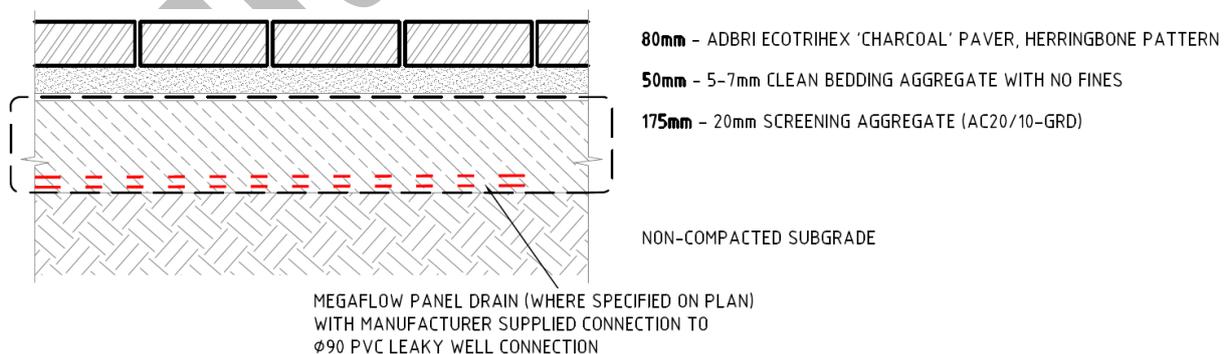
Pervious road base detail as constructed in 2016 in Kegworth Road, Melrose Park, South Australia
